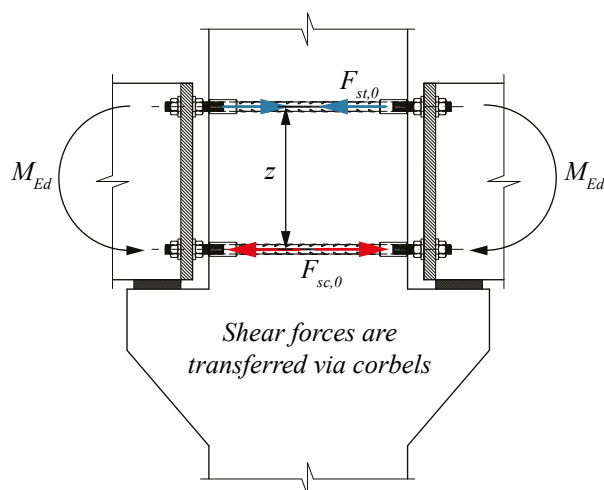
Structural behavior of anchoring couplers in double-sided connections.
